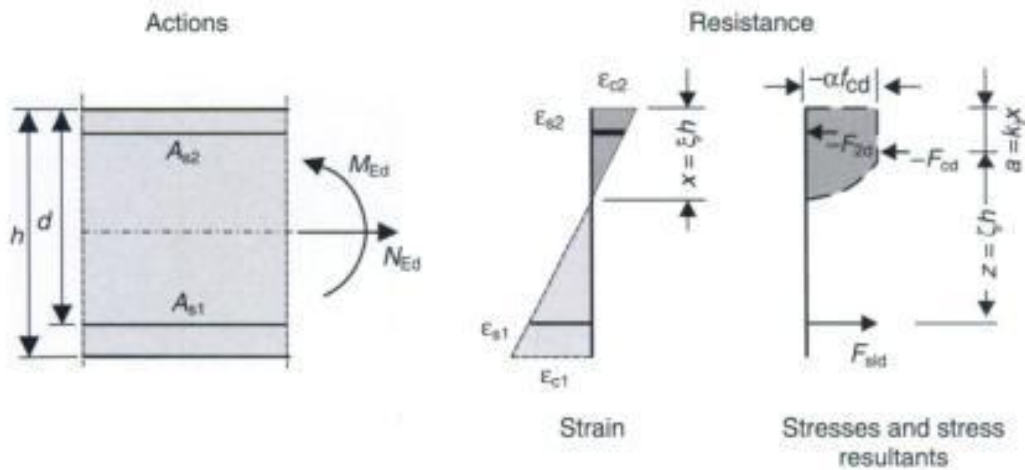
Actions, strains and internal forces (resistance) of a reinforced concrete section
